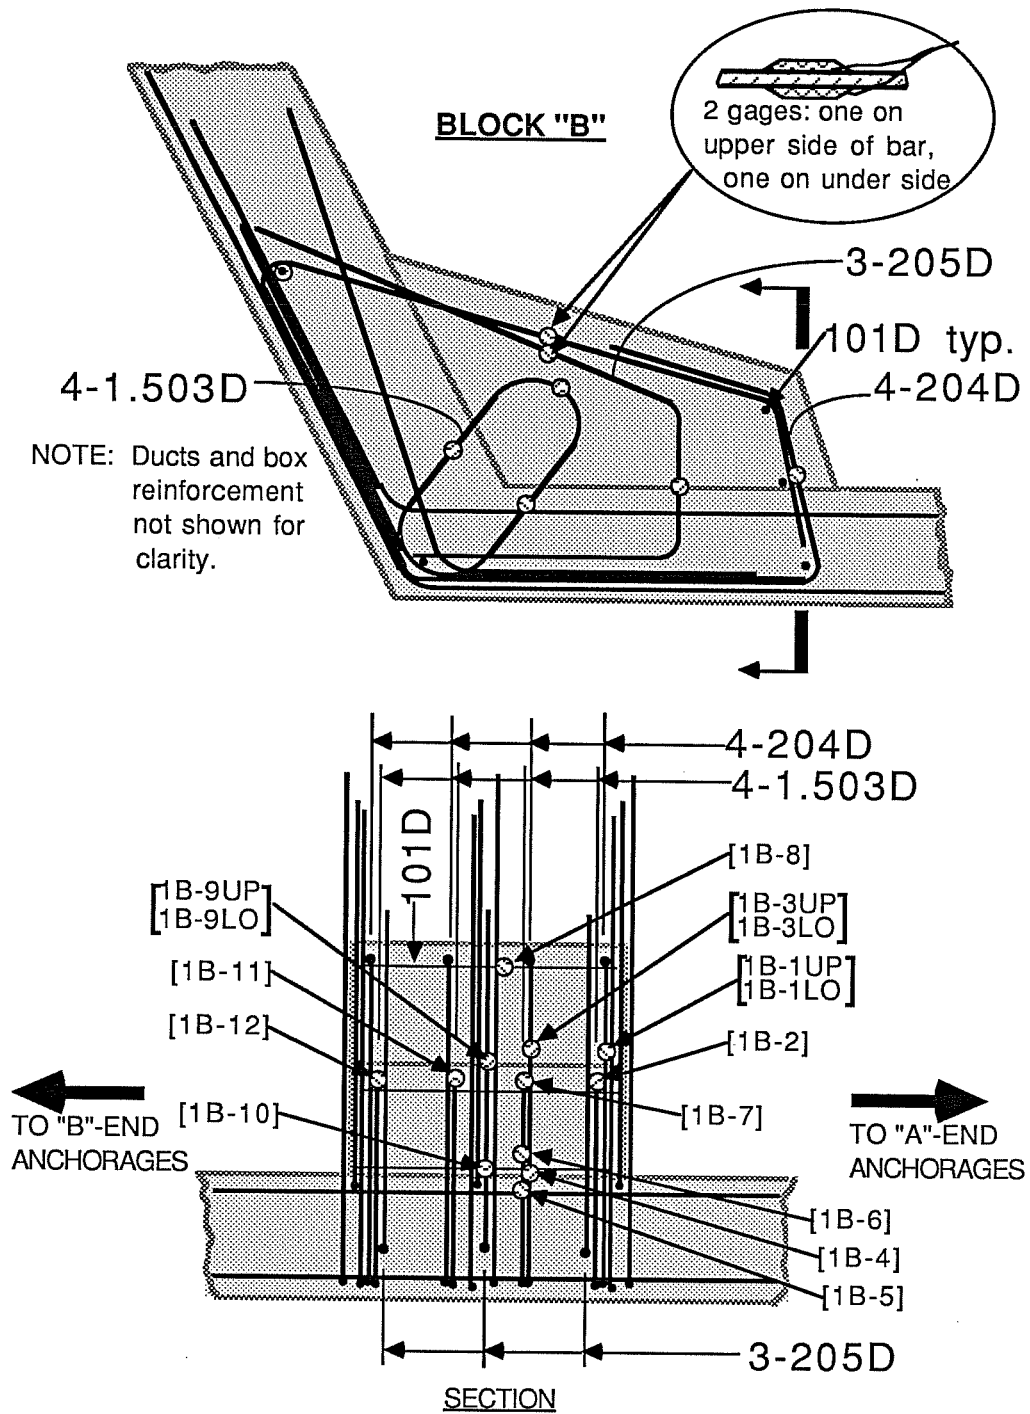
Deviator Reinforcement Strain Gage Locations, TEST 1B
